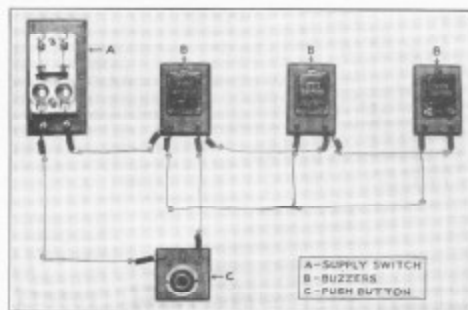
Wiring three buzzers to be operated by one push button. Price: 1 Blue Print, 2 Job Sheets, 35c.
